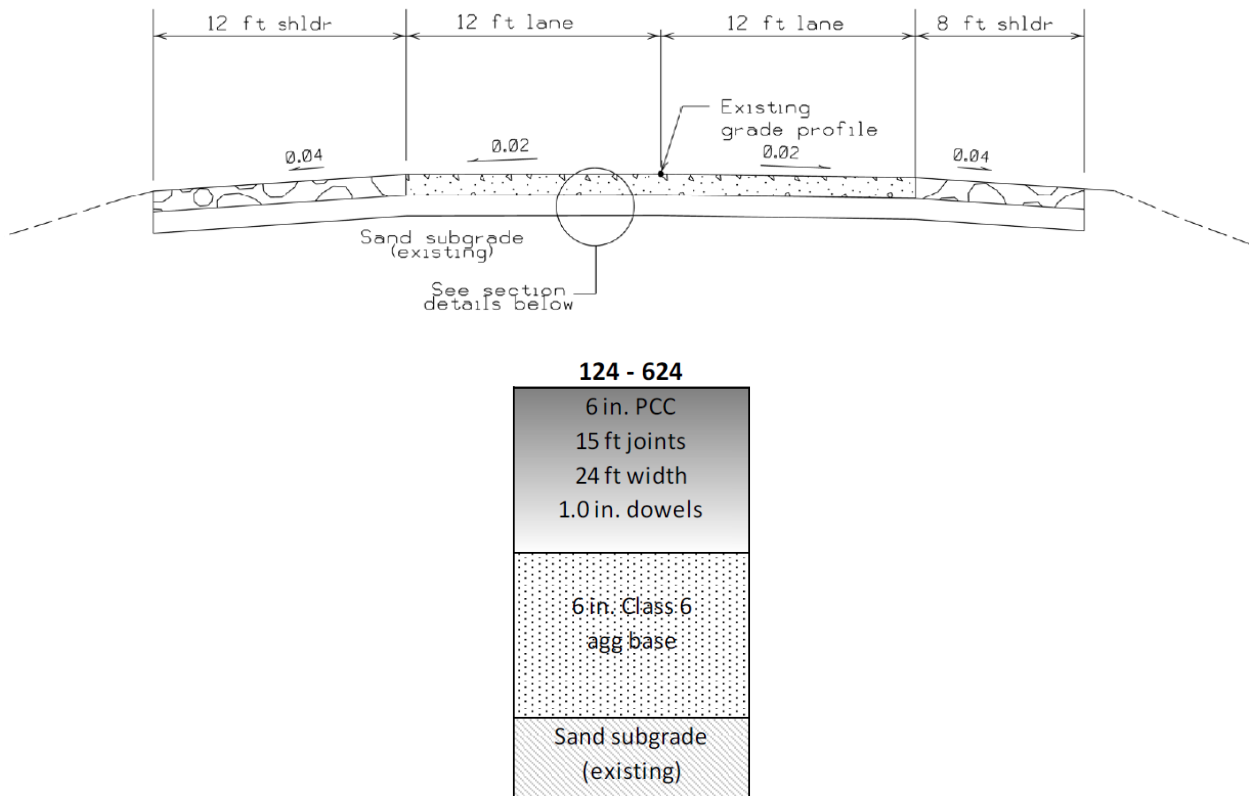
Concrete pavement section design (Cells 124-624) [64]
